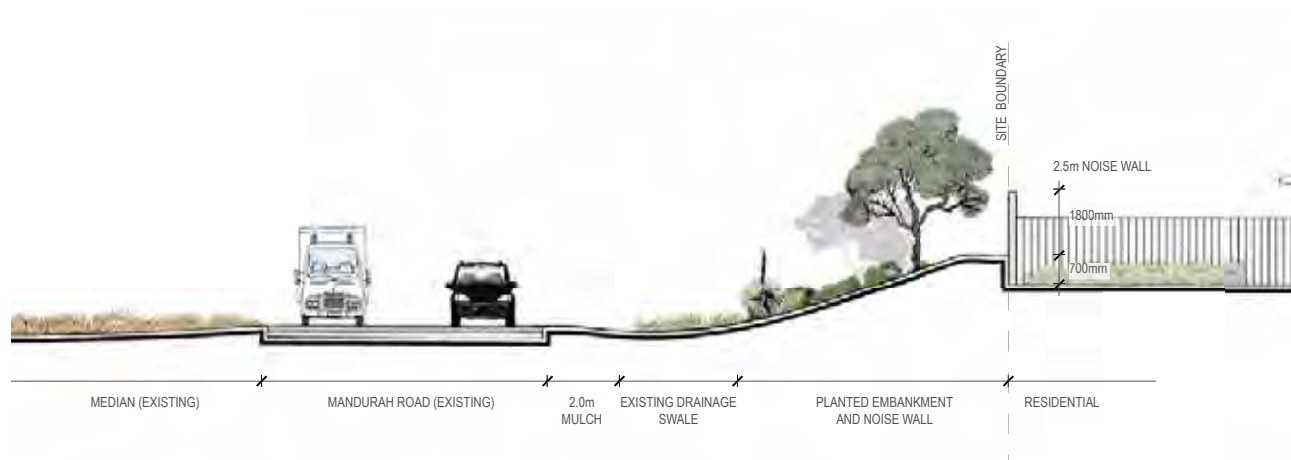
Cross section showing abutting dwellings relative to Mandurah Road
